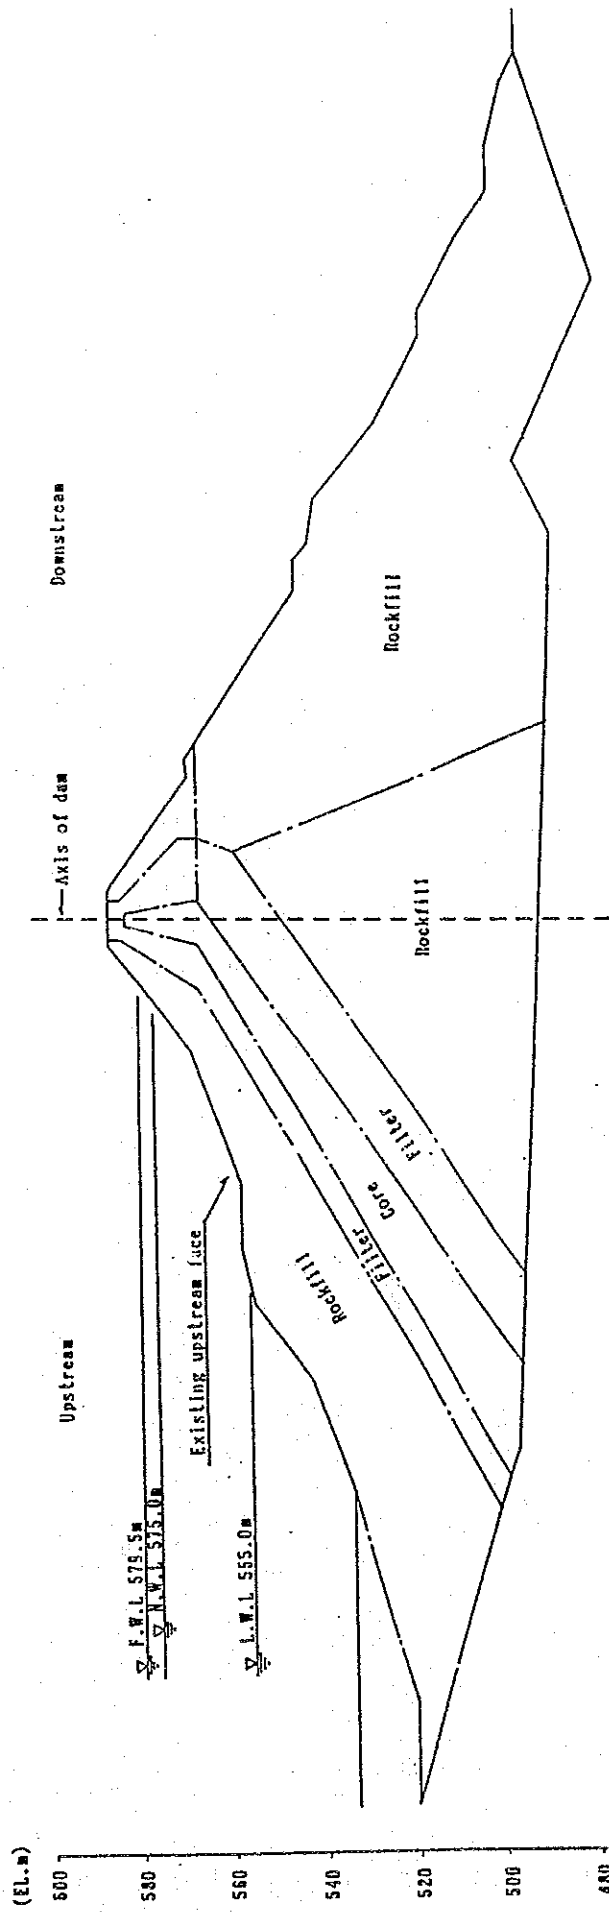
Binga Dam Cross Section D2 Typical Section As Surveyed in 1988
